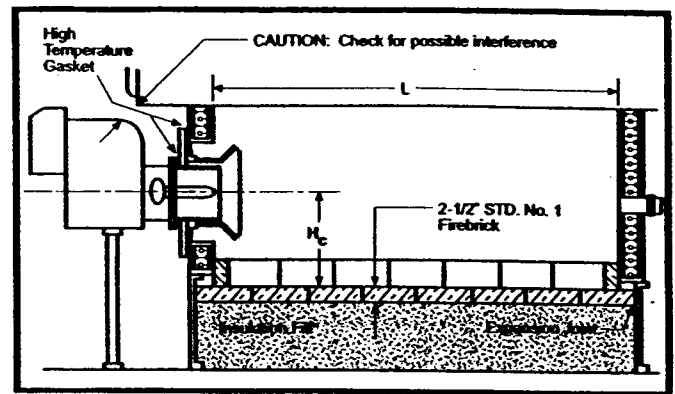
Type "R" Burner Installation with Reflector Frontplate
